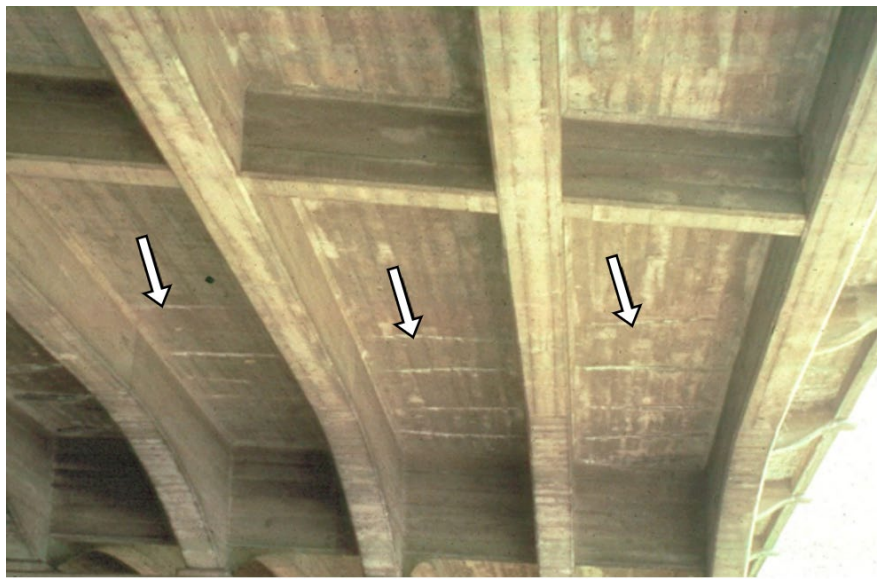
Flexure Cracks in Tee Beam Top Flange/Deck
